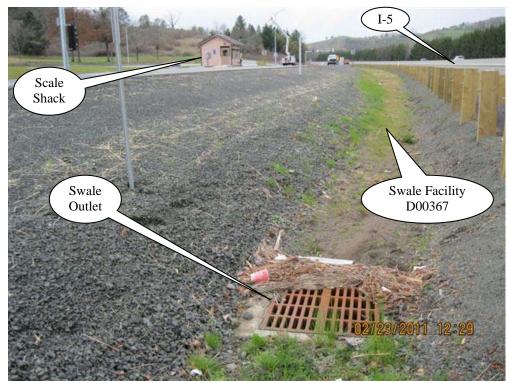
Photo looking north at swale with outlet shown at the bottom of picture.
